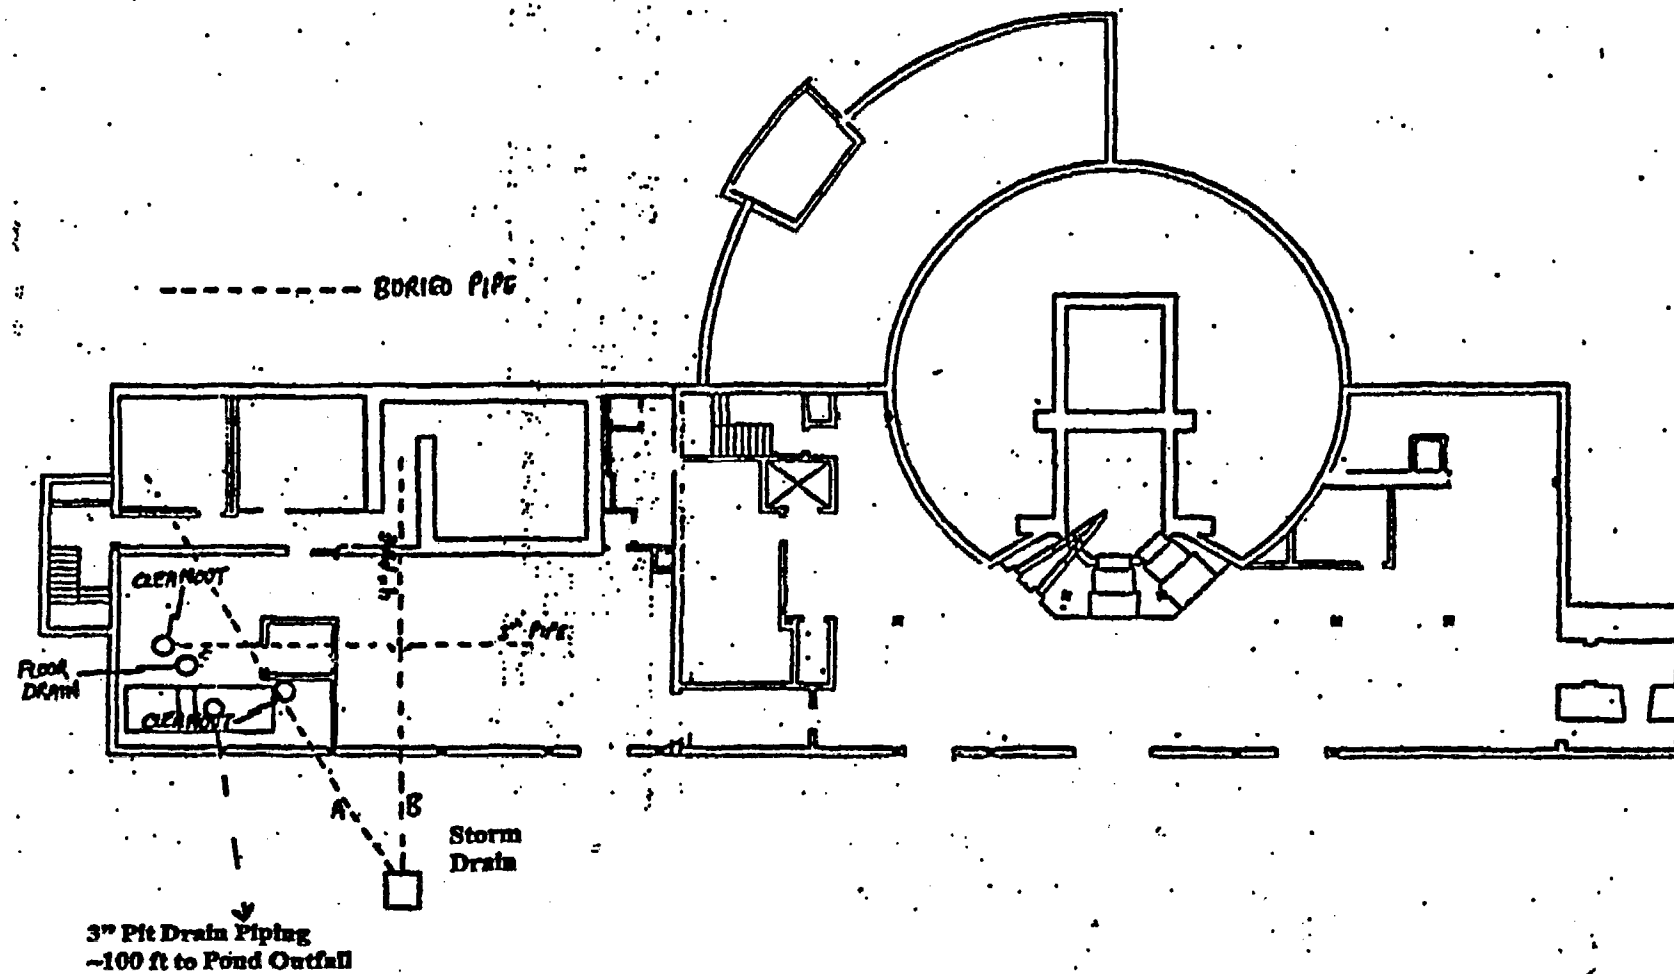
Drains Servicing the Former CAVALIER Facility.
